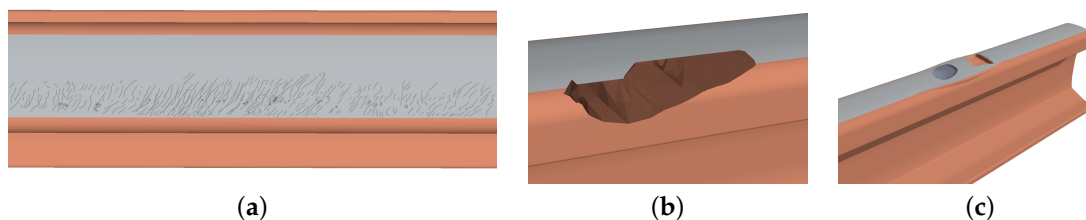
Three-dimensional representation of defects originating from RCF: (a) gauge corner checking and spalls can produce (b) shelling and (c) squats.
